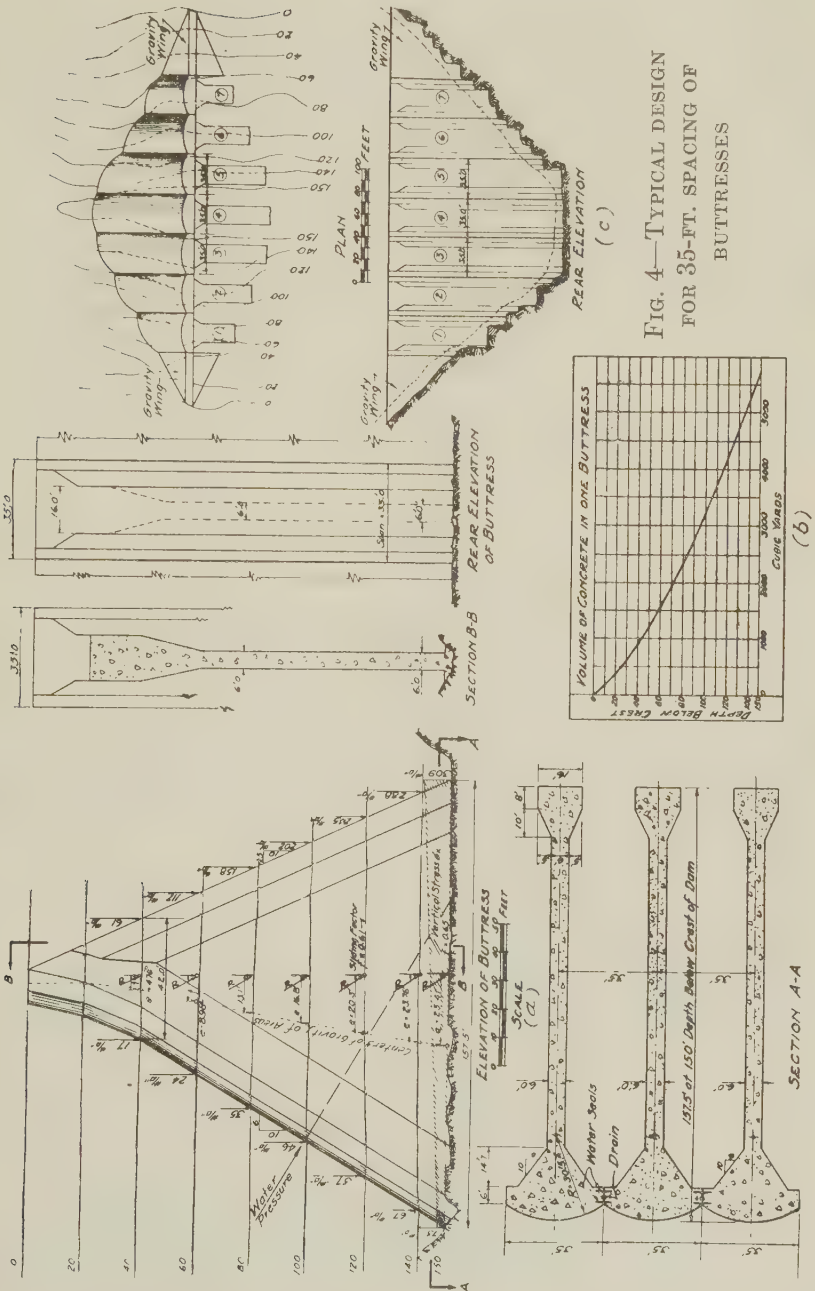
TYPICAL DESIGN FOR 35-FT. SPACING OF BUTTRESSES
